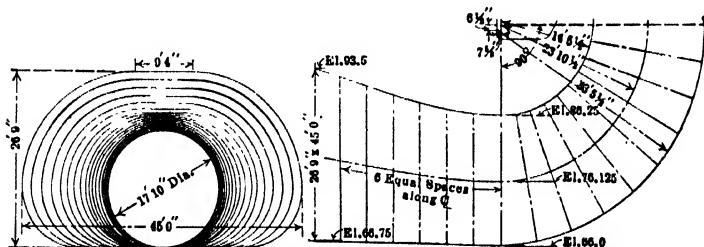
Typical longitudinal section and cross-sections of concrete draft tube.
